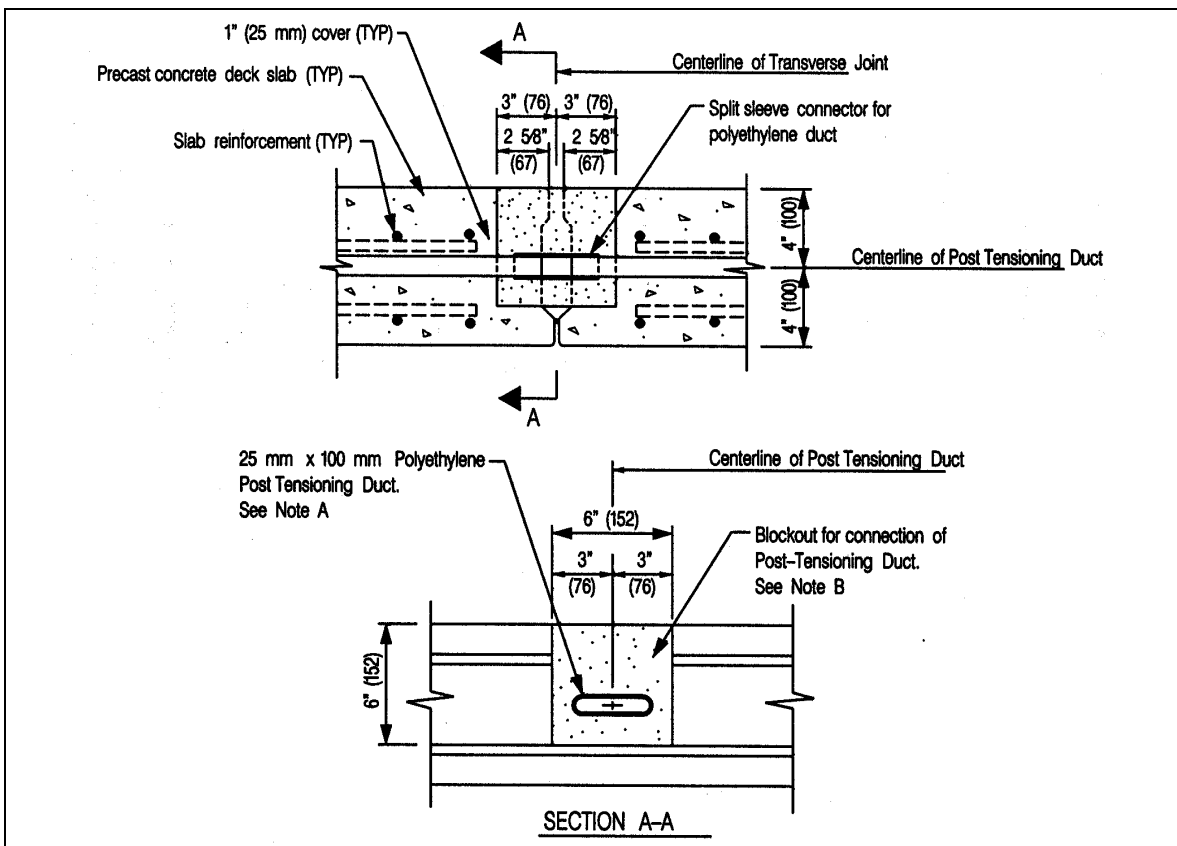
Typical transverse joint section at post-tensioning duct (PCINER, 2002)
